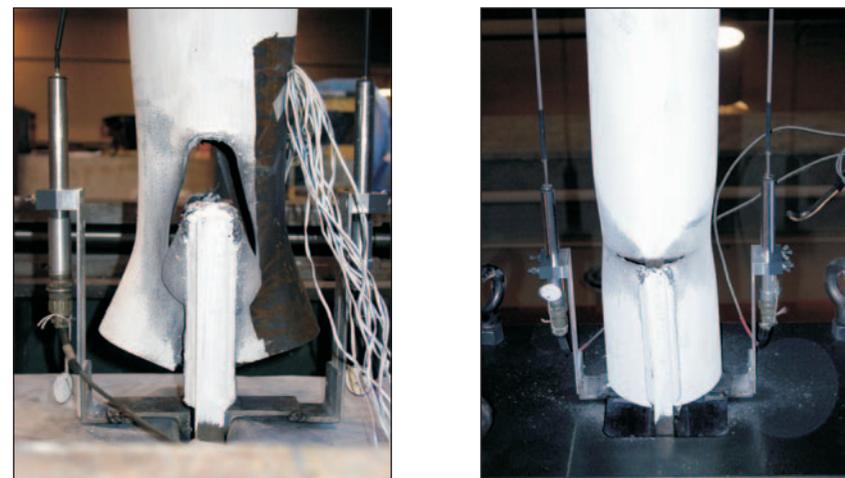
Typical slotted HSS-to-gusset connection failures: tear-out failure (left); net-section fracture (right) [images courtesy of the University of Toronto]
